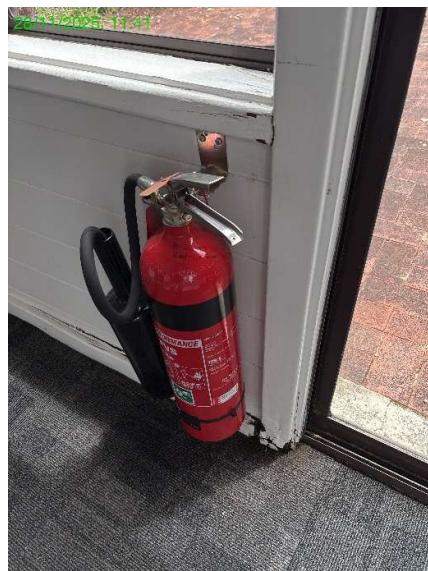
Skirting and timber door frame has rot. Note internal and external finishes at the same level.
